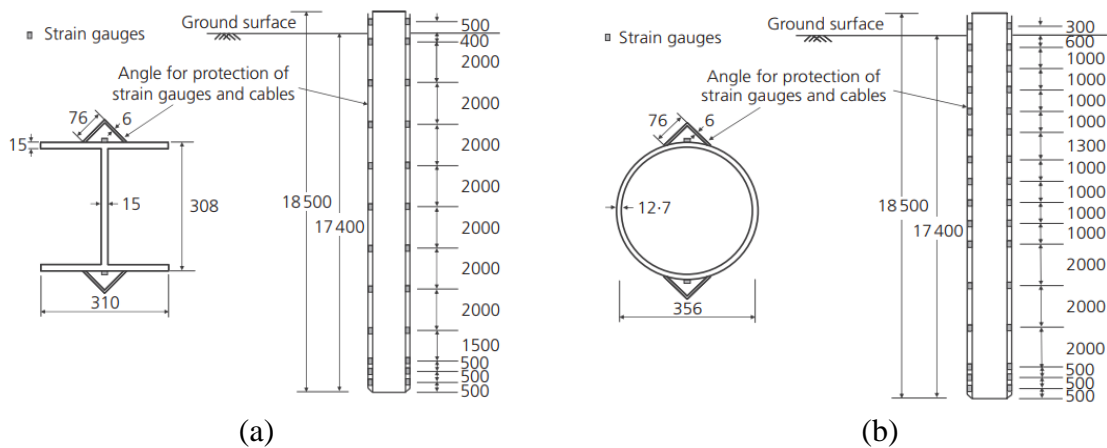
Instrumentation details: (a) H pile; (b) closed-ended pipe pile (dimensions in mm) (Bica et al., 2014)
